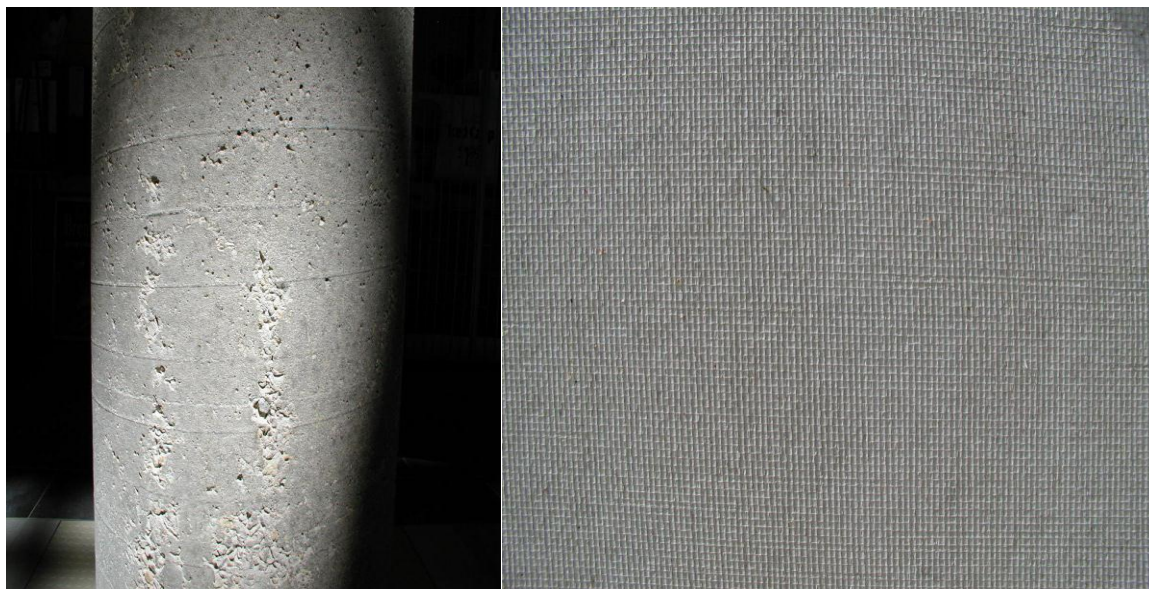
Resultant concrete surface cast in fabric formwork. Blow holes on surface of a concrete column cast in conventional mold (left) and surface of concrete column cast in fabric mold (right) (Delijani, 2010.).
